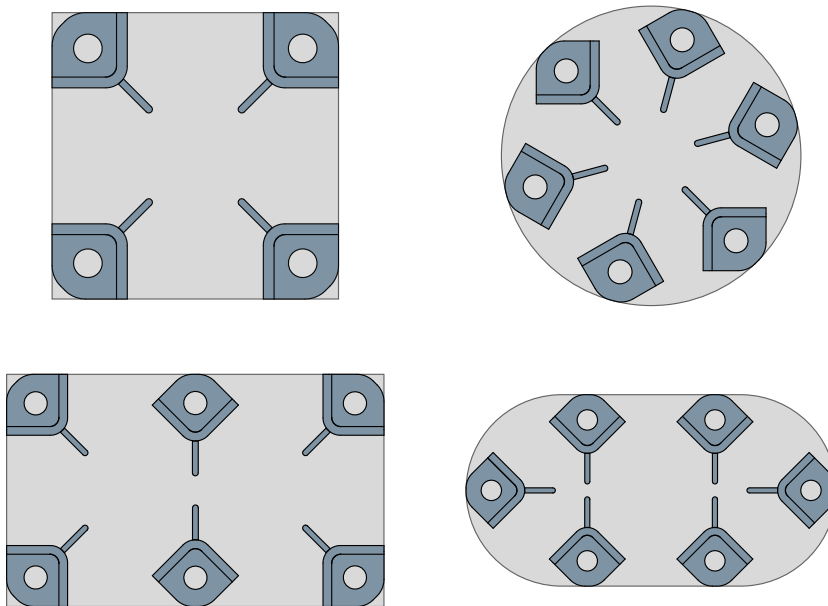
HPKM® Column Shoes and HPM Rebar Anchor Bolts in column connection.
